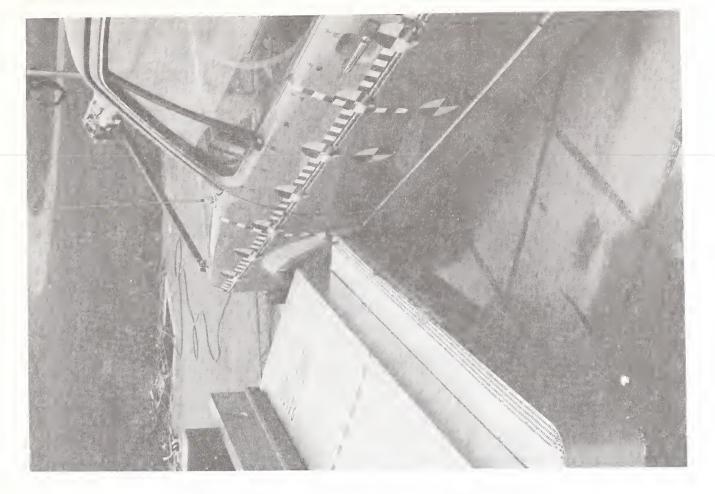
PRE-TEST CLOSEUP - VIEW 3
